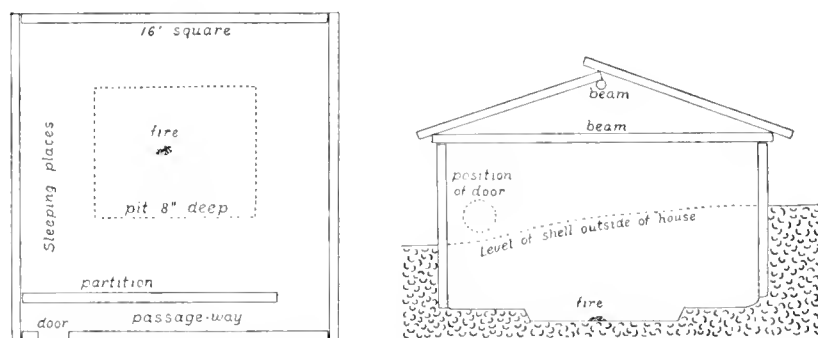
Ground-plan and vertical cross section of a Wiyot house.
